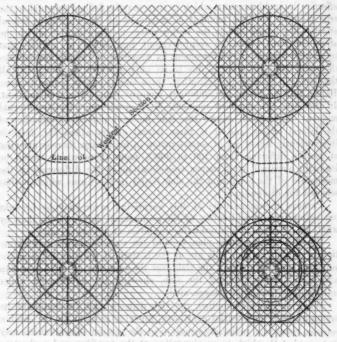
is an ordinary plan view of the writer's standard construction in which the slab rods are at the bottom of the slab between the supports and at the top of the slab over the supports. Fig. 17 is a plan and sectional elevation of the slab, showing its deformation under uniform load somewhat exaggerated.
